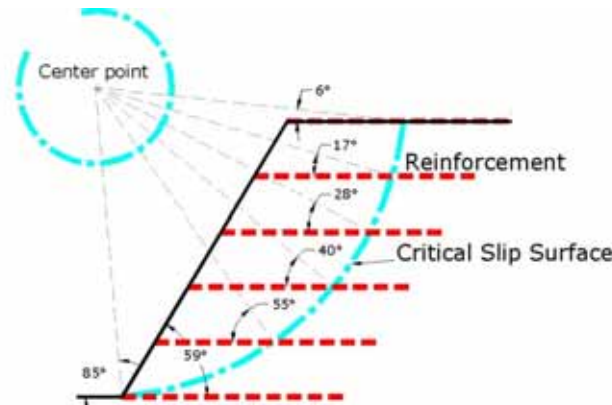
changing reinforcement orientation based on potential failure surface in reinforced slope
